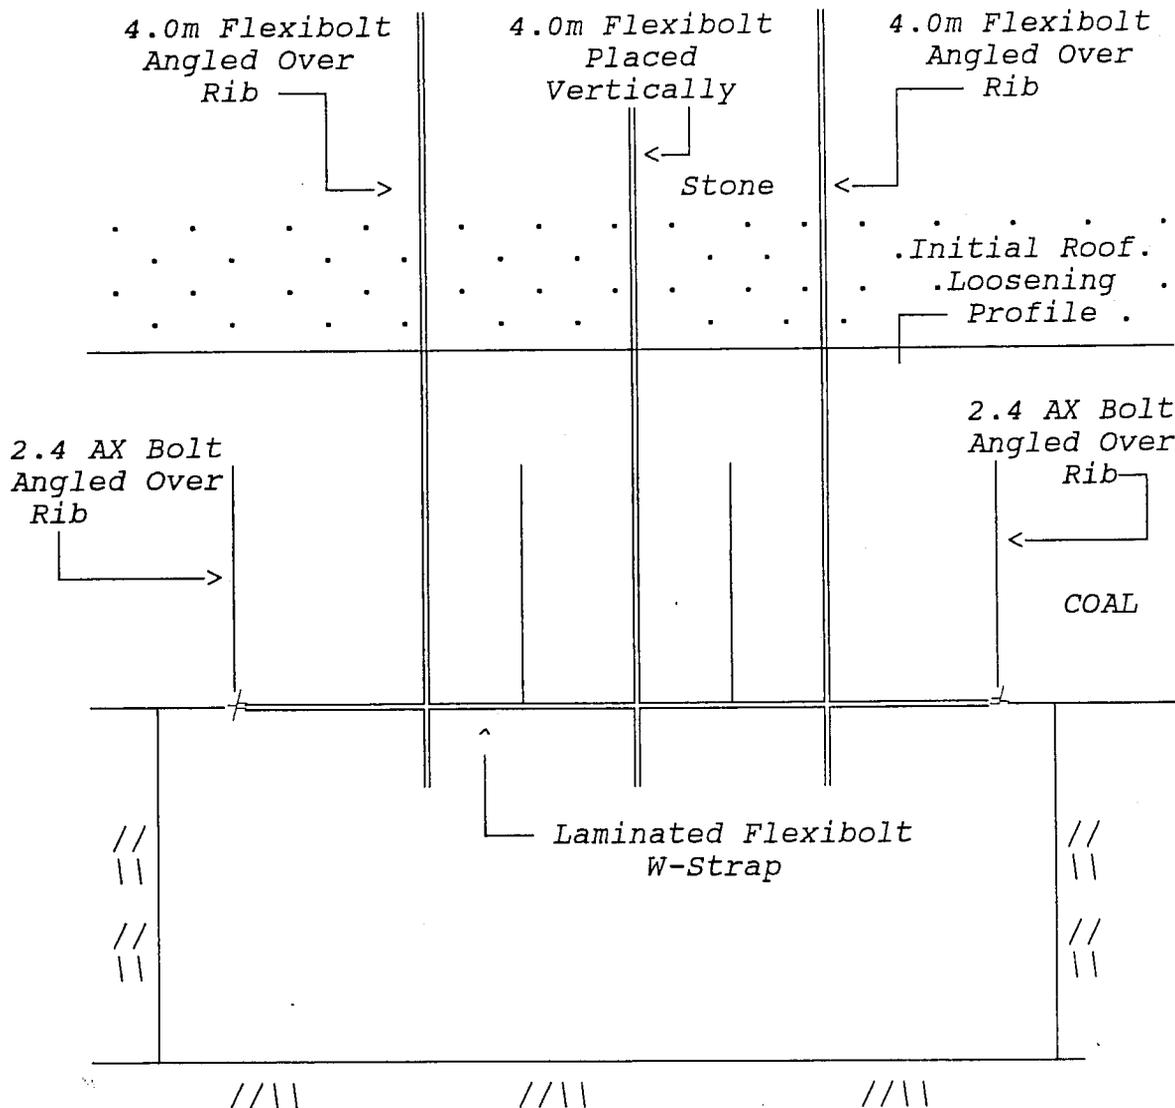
Shows a Section View of the Preliminary Flexibolt Pattern.
